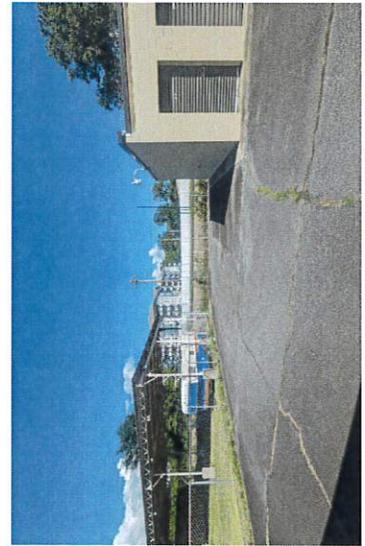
LOOKING WEST - BLDG A ON RIGHT
